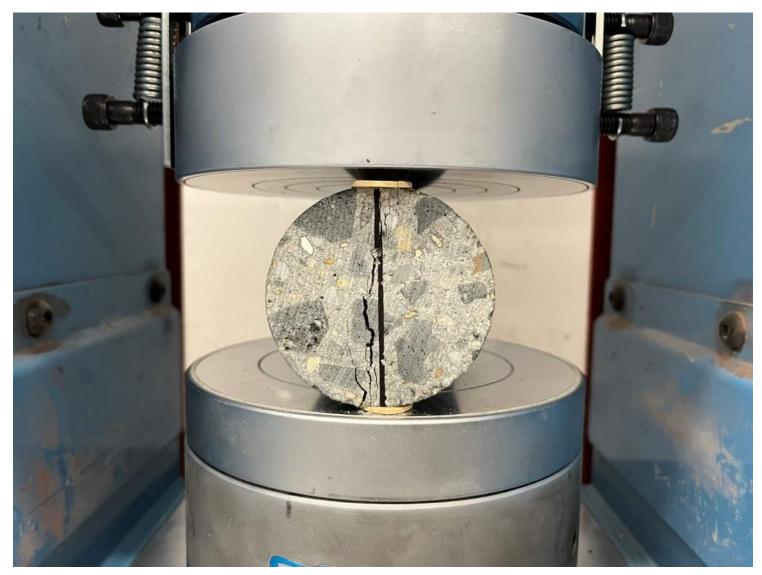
Split tension testing of specimen 4E-1 after peak load.
